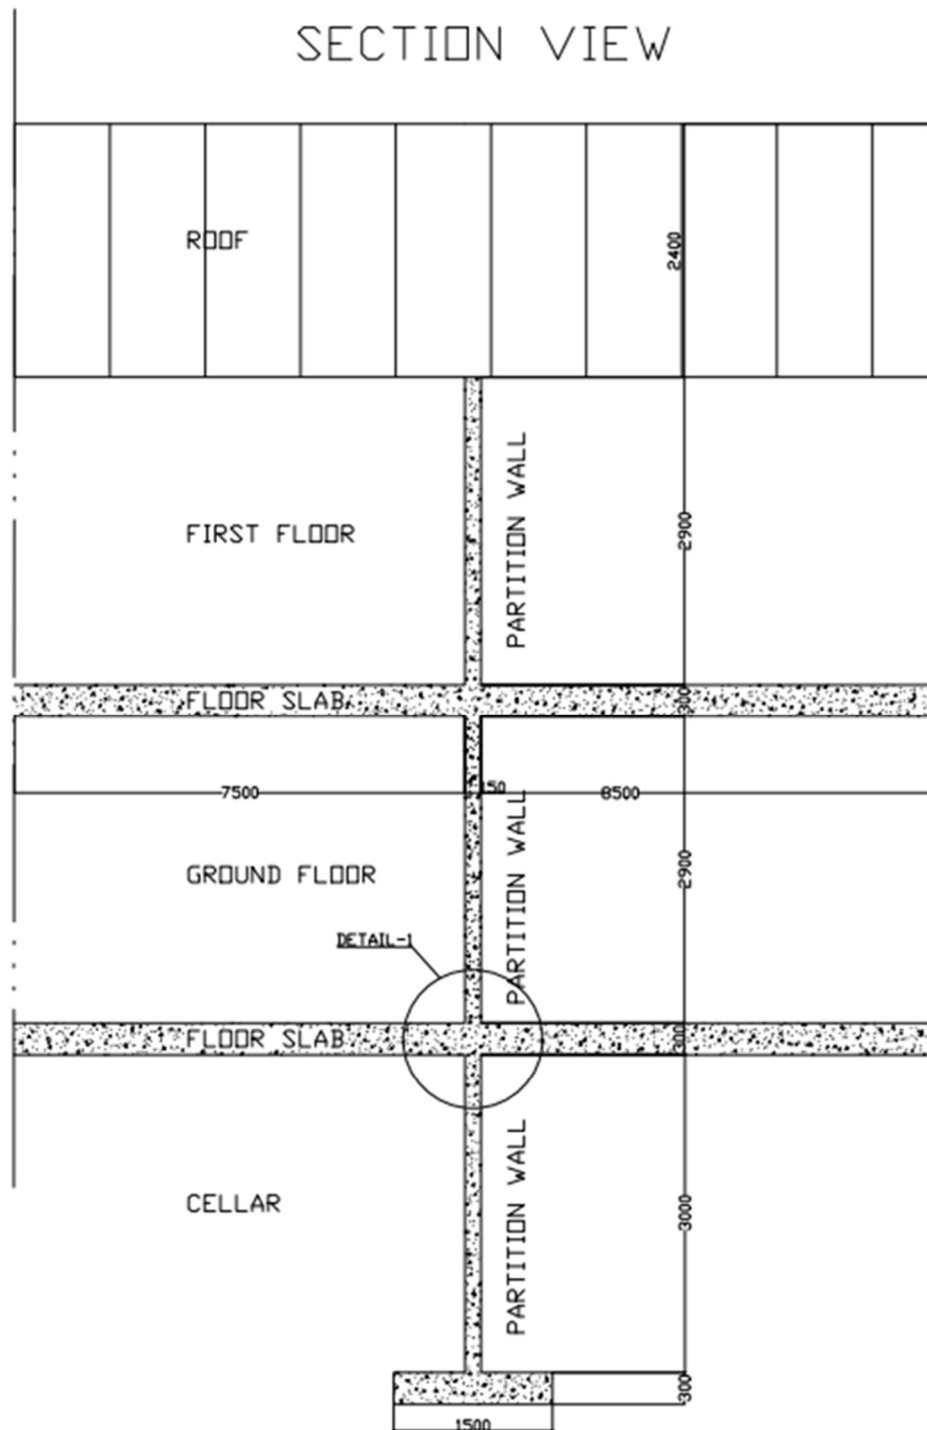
Section of the building with detailed dimensions applied to the load bearing partition wall
